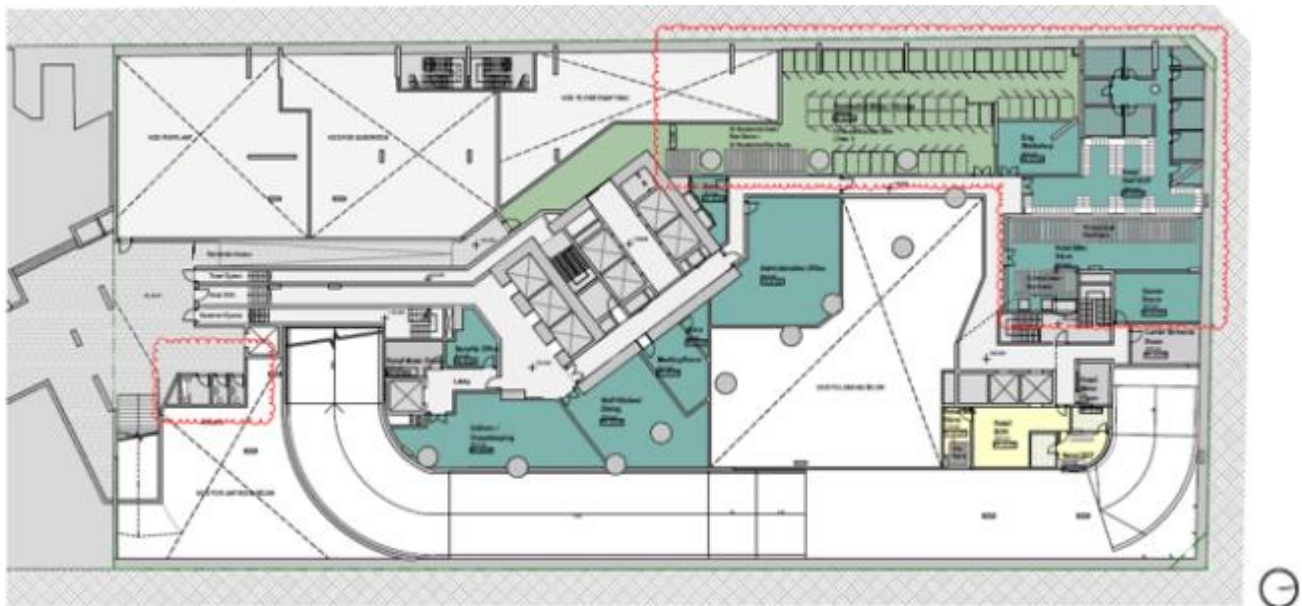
| Proposed lower ground floor (Source: Ethos Urban RtS amended architectural drawings)
